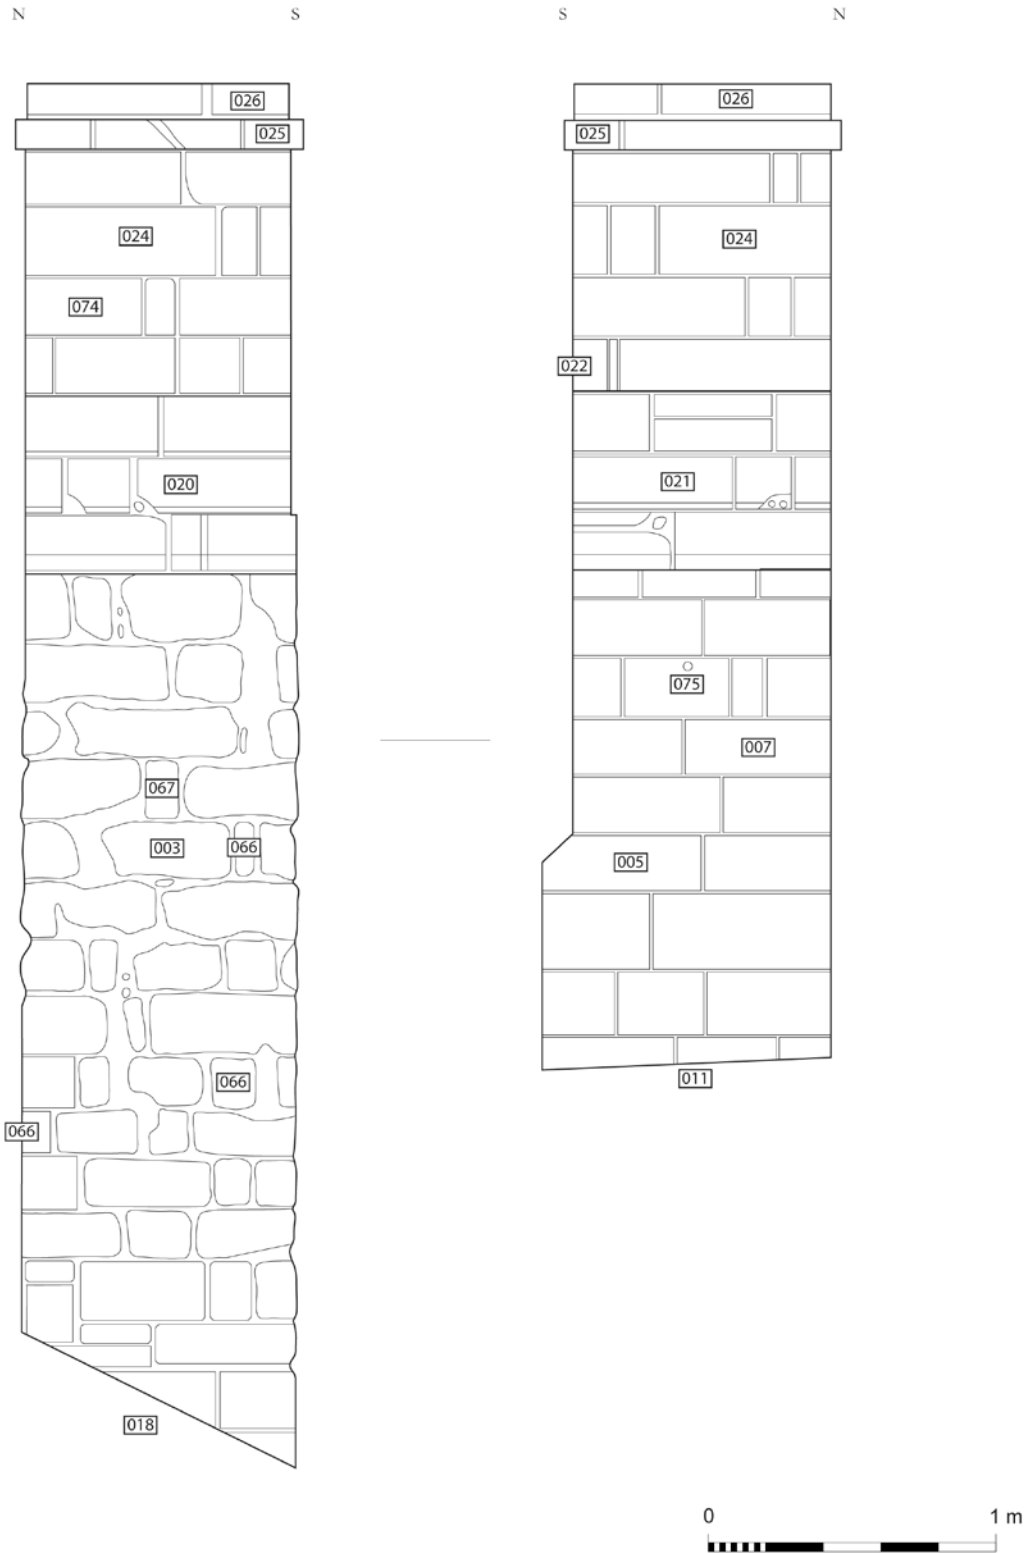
Chimney RC05, western elevation (left) and eastern elevation.
